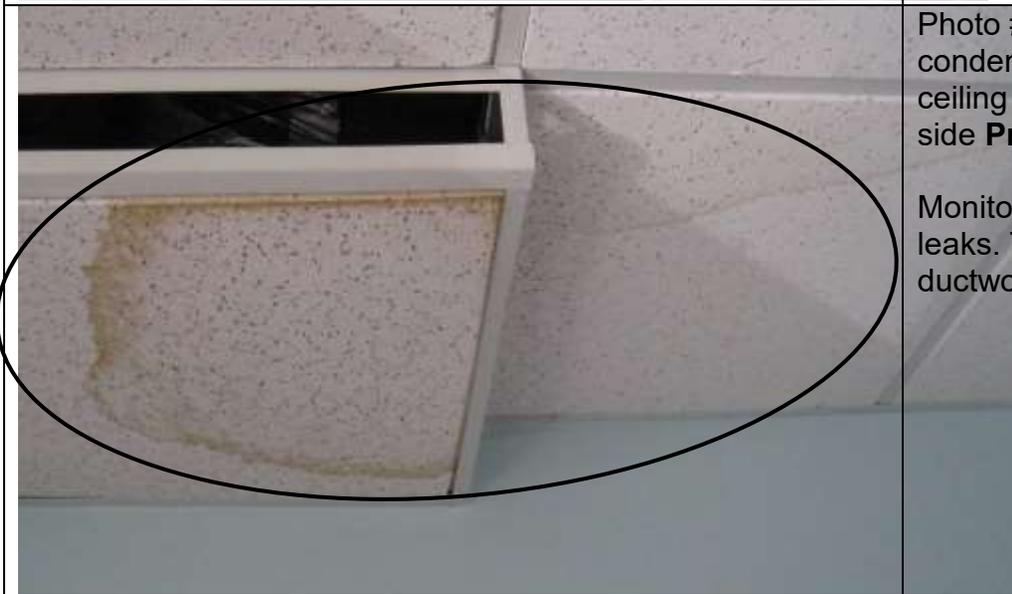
Water or condensate stains on acoustic ceiling tiles in upper south side Prime America office.
